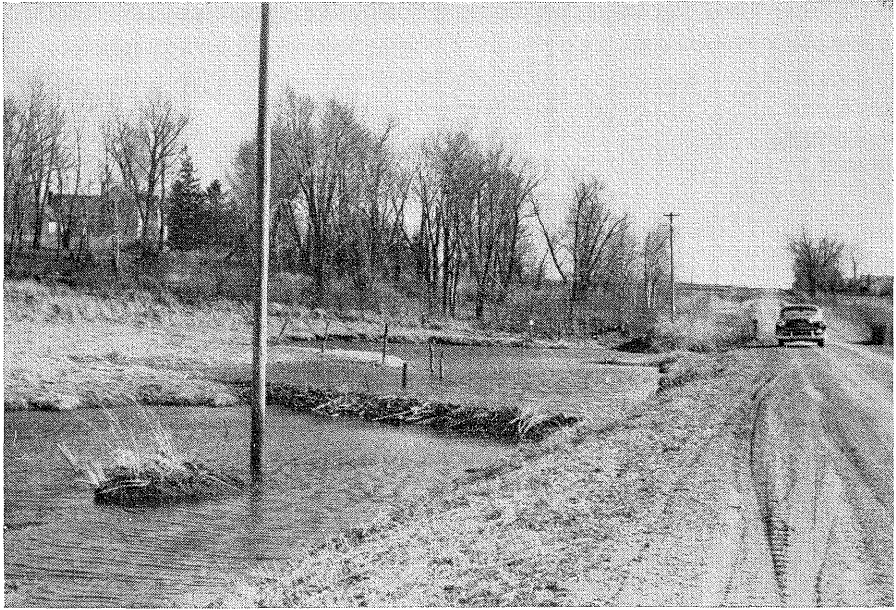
A beaver problem. The dam in the roadside ditch and bank burrows caused the road shoulder to wash out.
